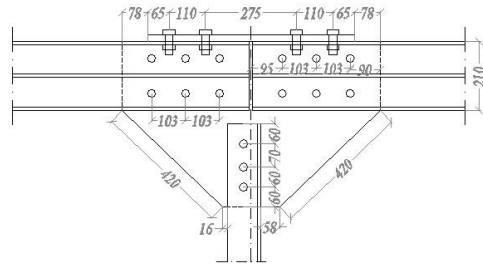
Single-bay structural cross-sections of trusses of the perimeter frame in direction Y
